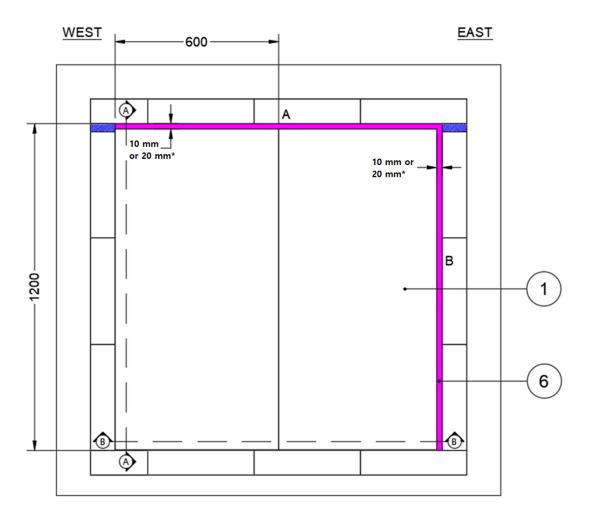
Elevation view of the test specimen. The image is included to demonstrate the location of the assessed joints. The separating element construction may vary based on the applicable Hebel panel construction details.
